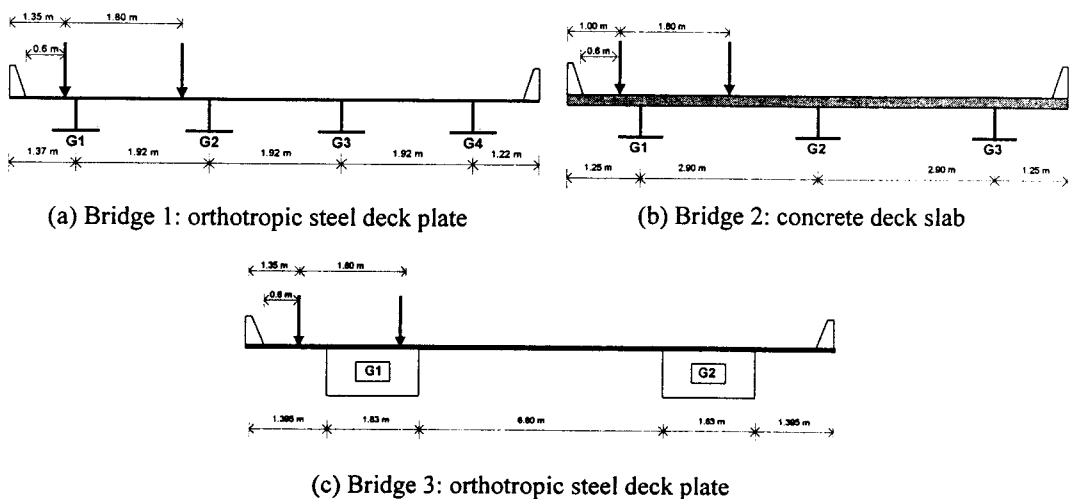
Cross-sections of Bridge 1, 2 and 3 subjected to Thai truck loading
